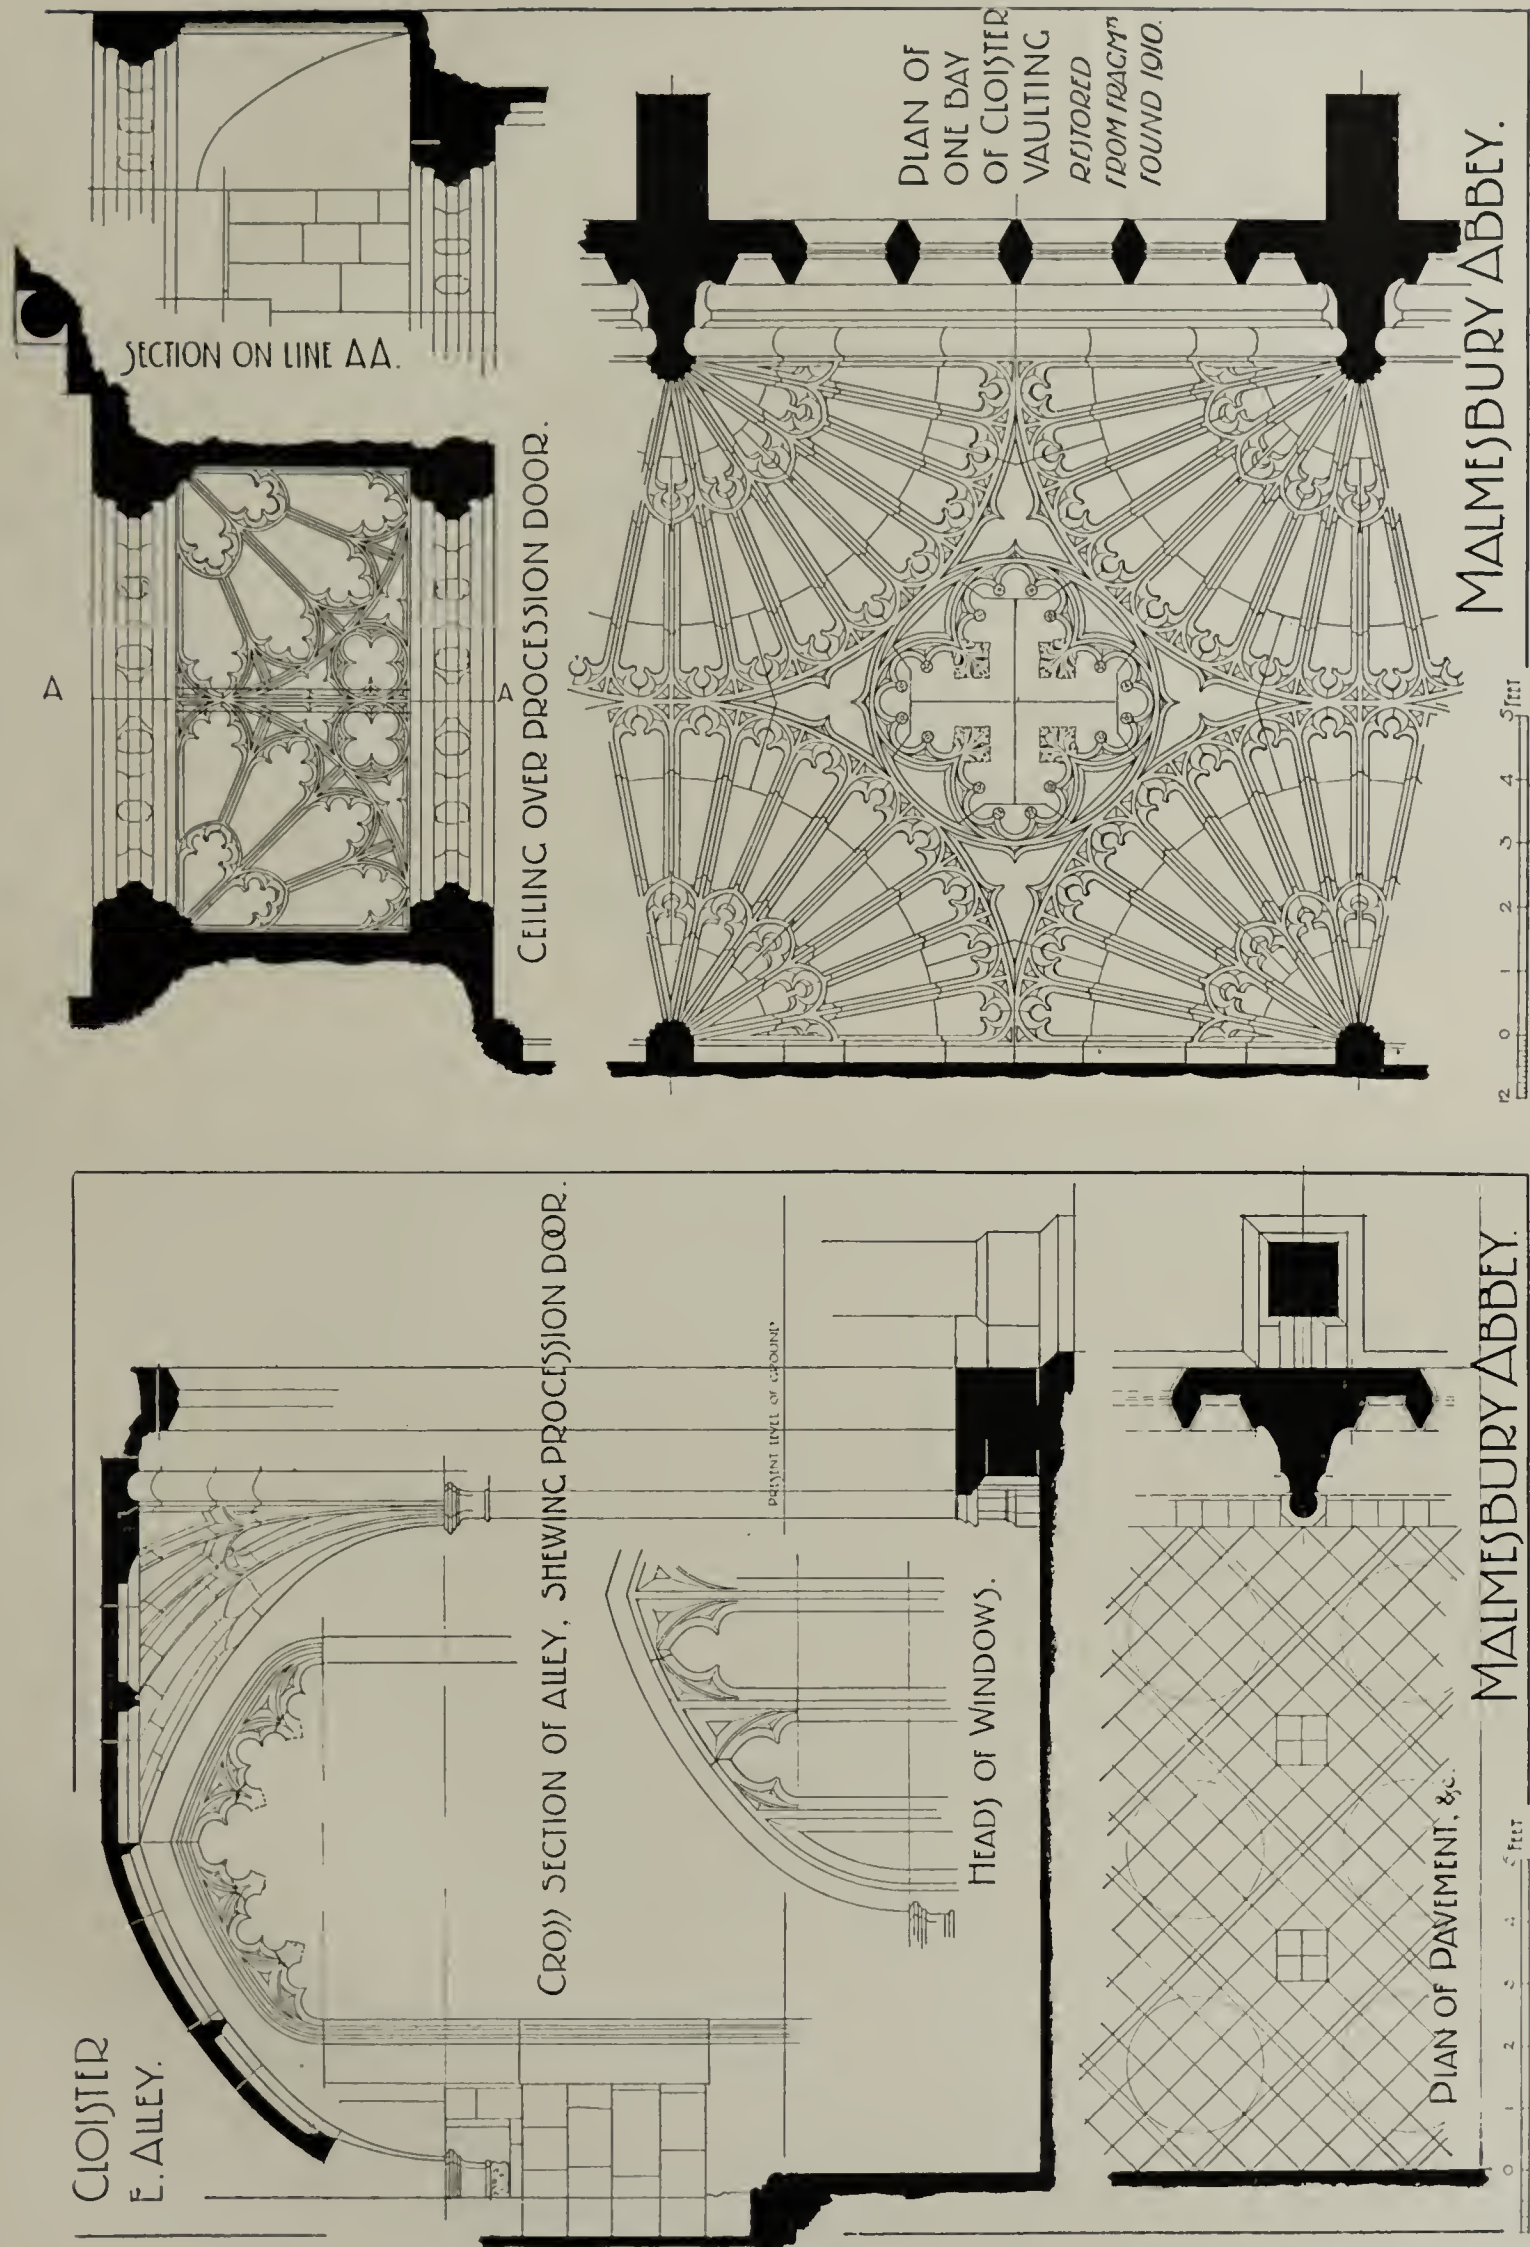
Sections and plan of cloister restored from remains found in 1910.
